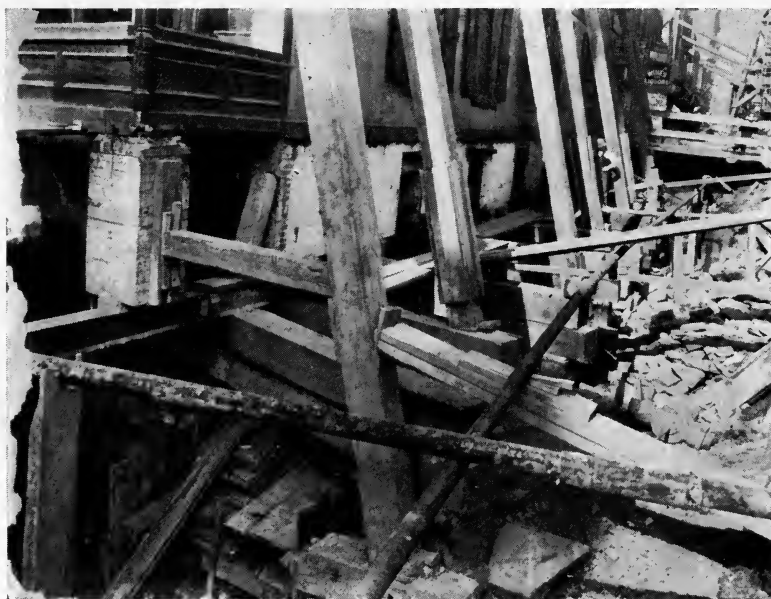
Shores Used in 1902 during the Construction of Subway,
